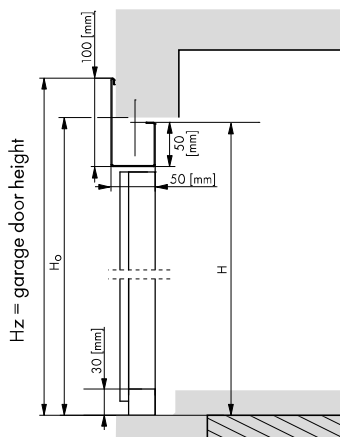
Installation in the opening (vertical section) of door with renovation frame.
